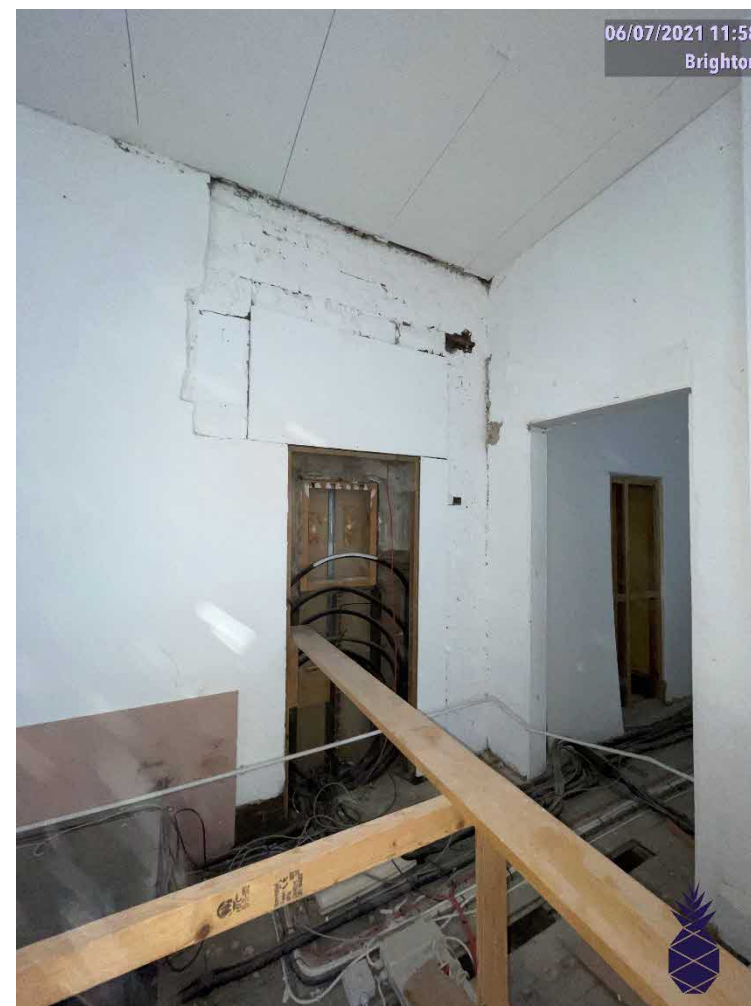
Existing openings from the first floor space to the double-height space to the north.
